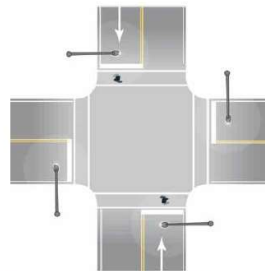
Drawing. New design for intersection lighting layout for crosswalks.
